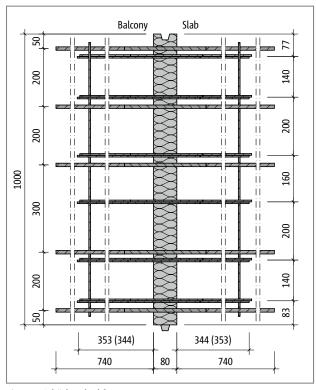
Schöck Isokorb® T type D-MM2-VV1: Layout
